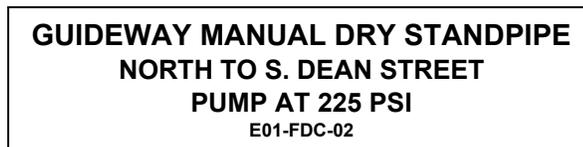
Sign Examples – Garage and Station Sprinklers/Standpipes
